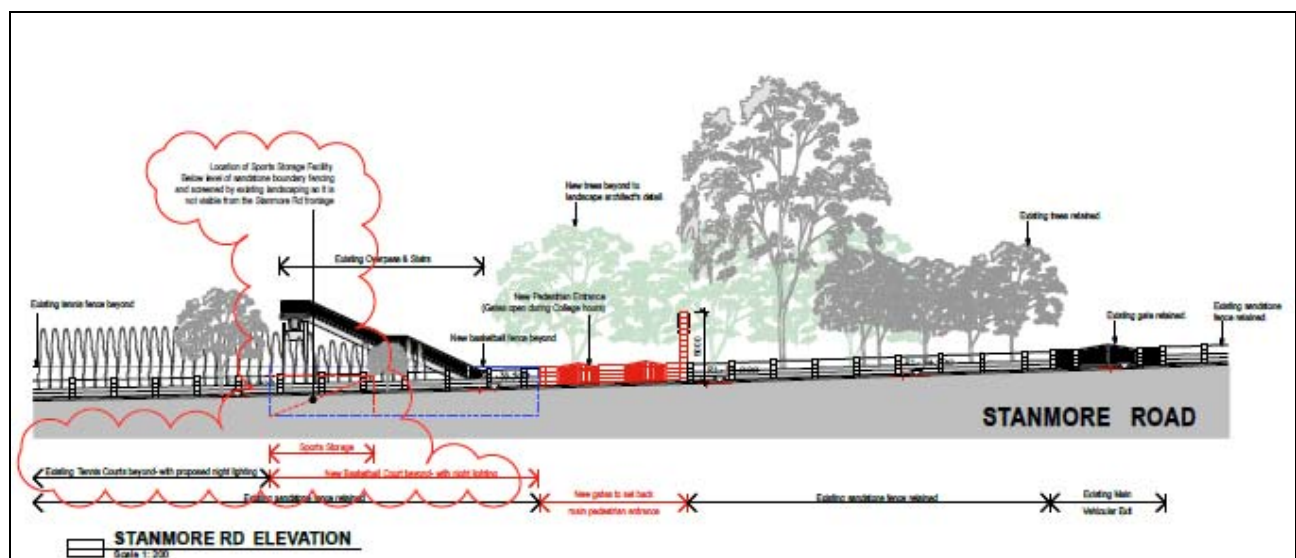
Stanmore Road elevation of the proposed pedestrian entrance and signage
